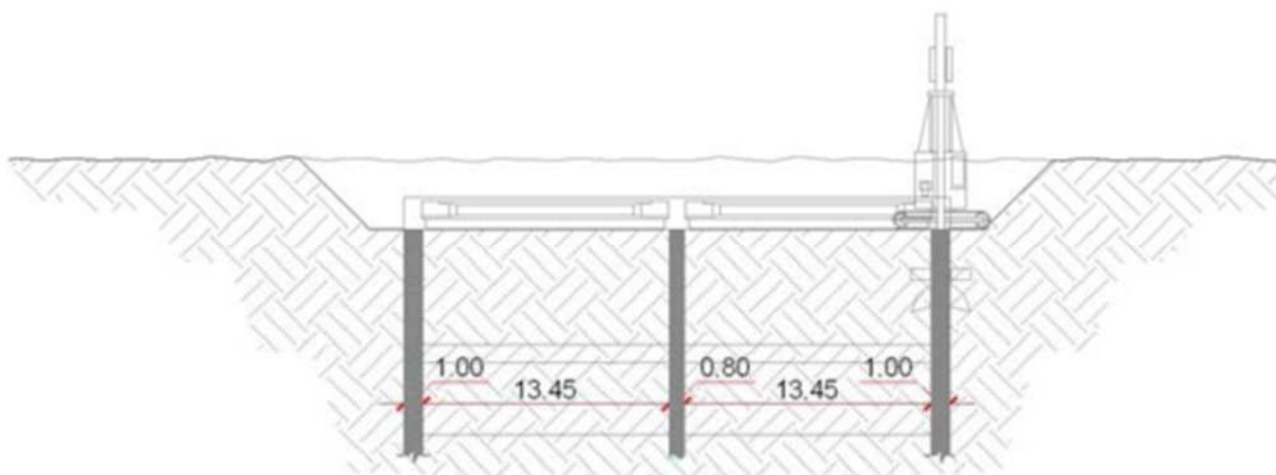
Construction of type B cut and cover tunnel. Source: SPV
